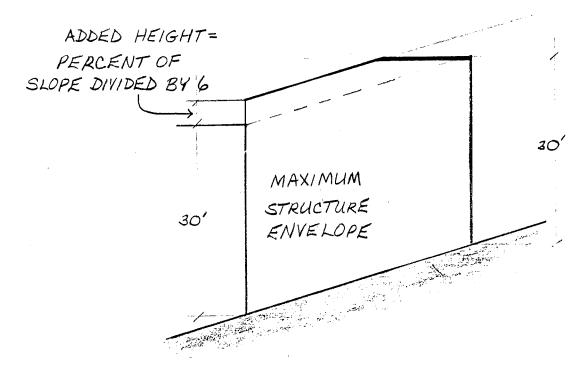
LOWRISE 1, HEIGHT LIMIT ON SLOPED SITES
